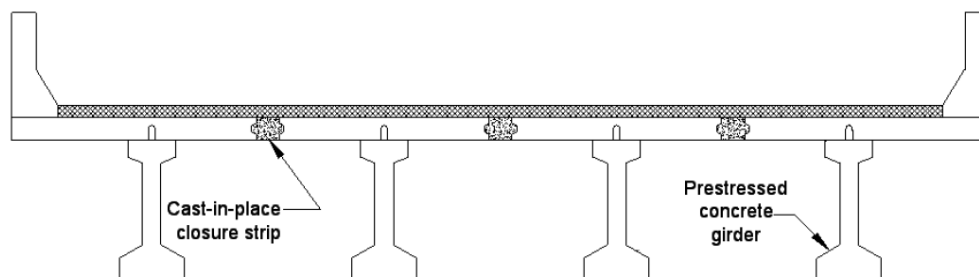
Prefabricated bridge superstructure made of bulb-tee girders
